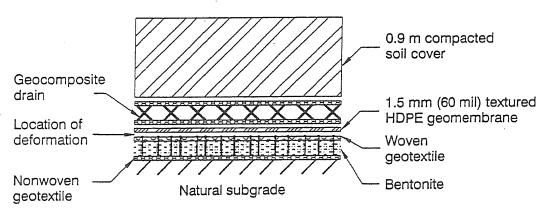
Detailed cross section of Test Pad G (after Scranton 1996).
